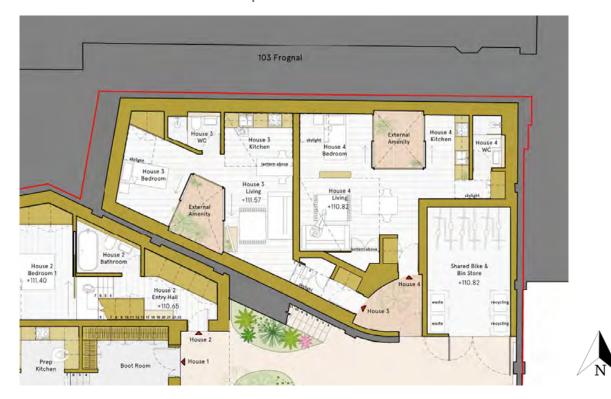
Proposed ground floor layout of the two porposed homes to the northeastern corner of the site
